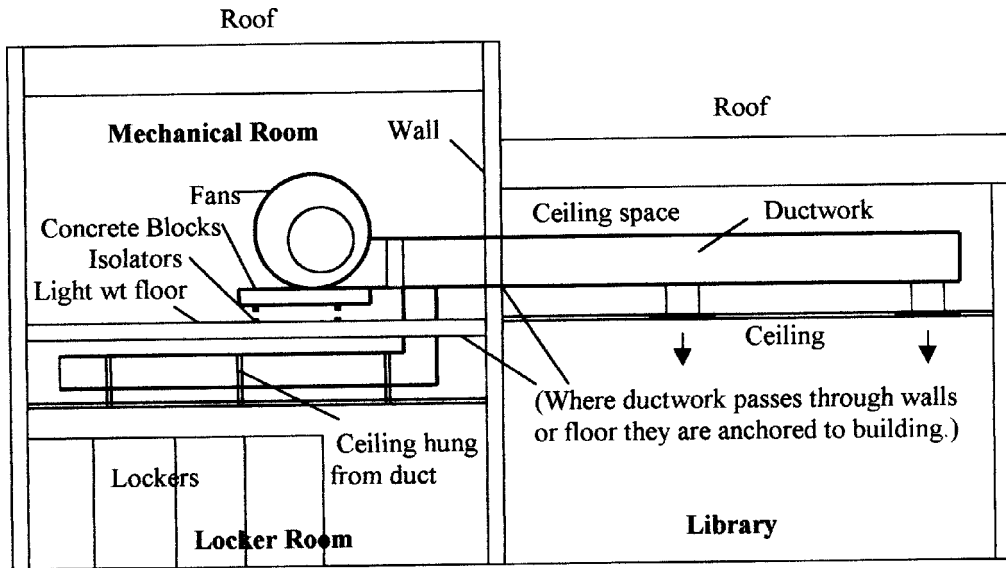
Elevation cross section of mechanical room with 30 pieces of rotating equipment transmitting vibrations and loud rumbling noises to the floor of the equipment room, and to adjacent areas of the library and locker rooms.
